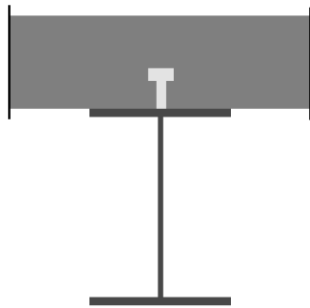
Illustration of a steel stud welded to the top flange of a steel girder. When the concrete deck is casted onto the stud and the steel girder, interaction between the steel and the concrete can be achieved
